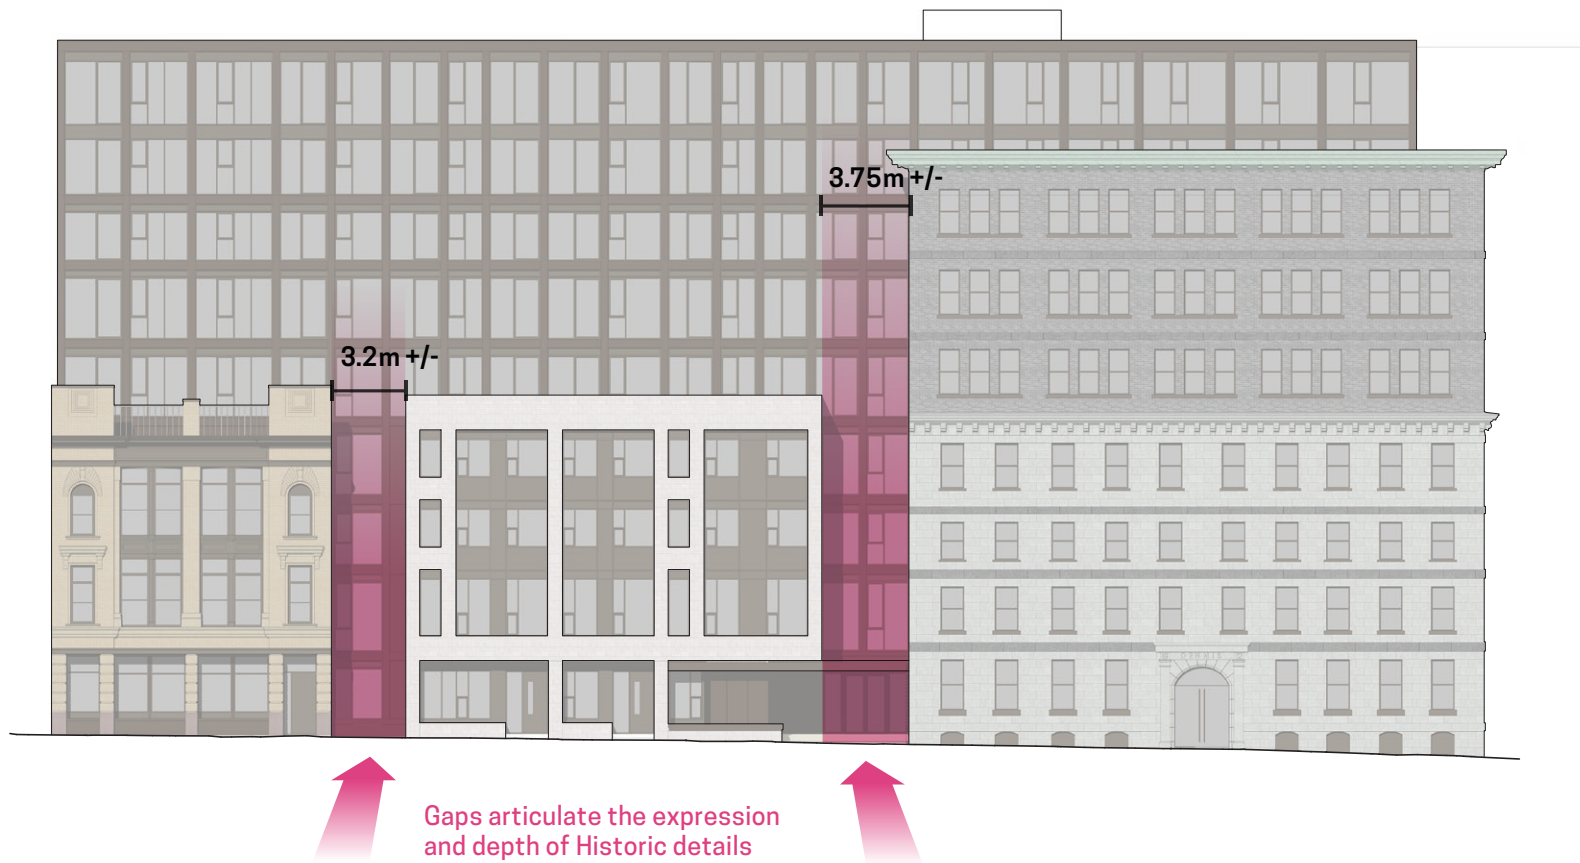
c Streetwall Width: New construction gaps on Granville to maintain visual prominence of heritage resources
